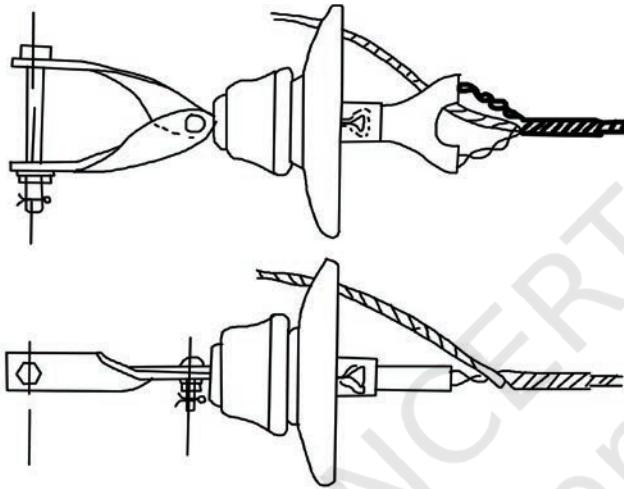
Strain Insulator Assembly with Helically Formed Fittings
